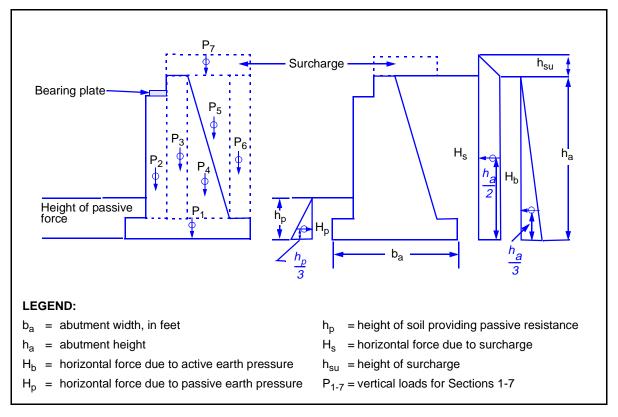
Abutment Sectioning, Load Centers, and Soil Forces
